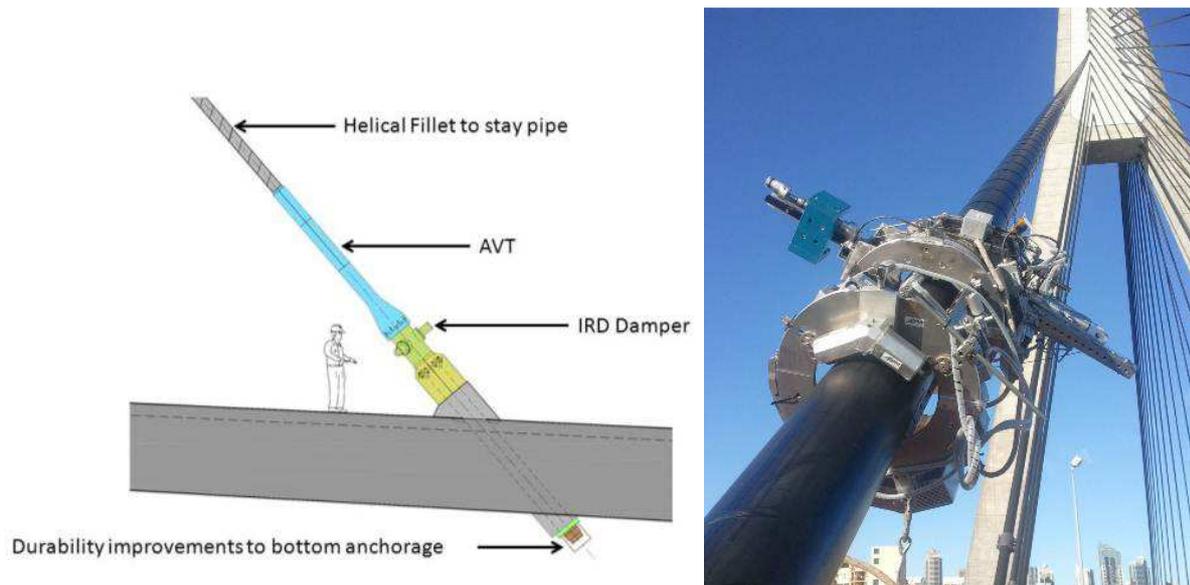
Extract from drawings showing additional stay components being installed at deck level and on-site helical fillet trial
